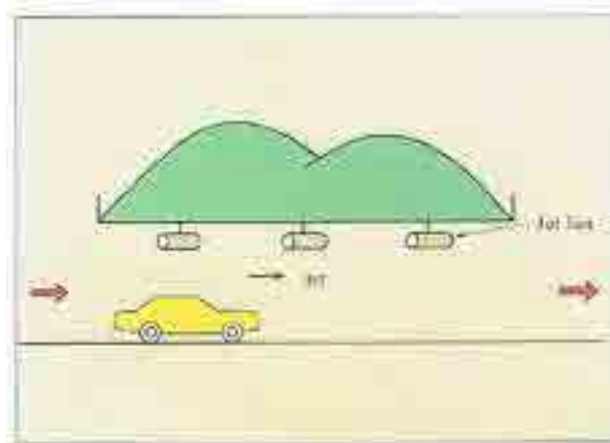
LONGITUDINAL VENTILATION SYSTEM (JET – FAN TYPE)
